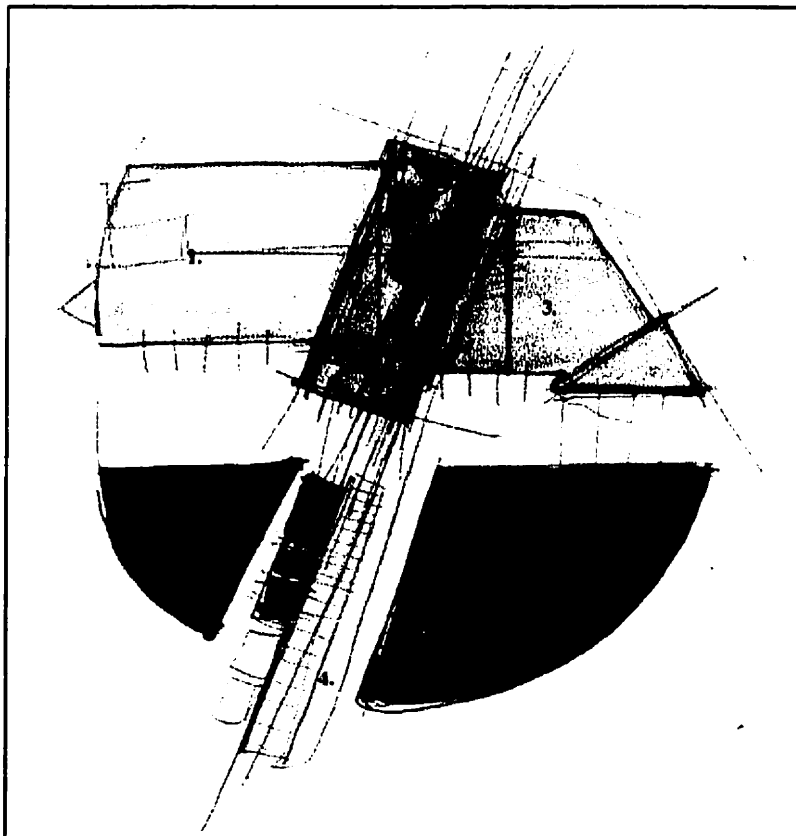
Conceptual sketch of the building. 1. Worship Space, 2. Entry, 3. Hall, 4. Outside Fountain and Stairway.
